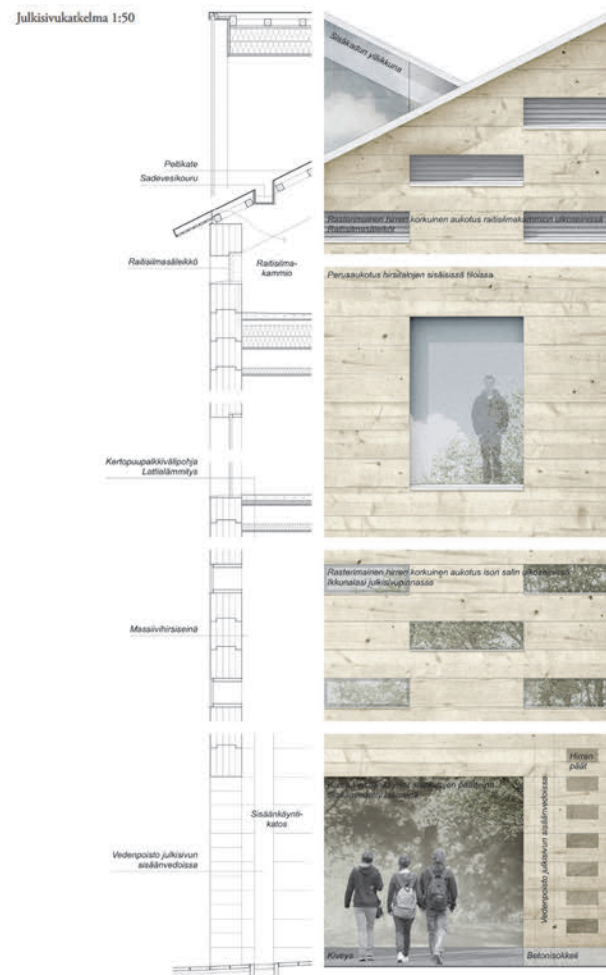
Façade excerpt showing the detailing of Monikko. Image: AOR Architects Ltd. (Published with permission)
